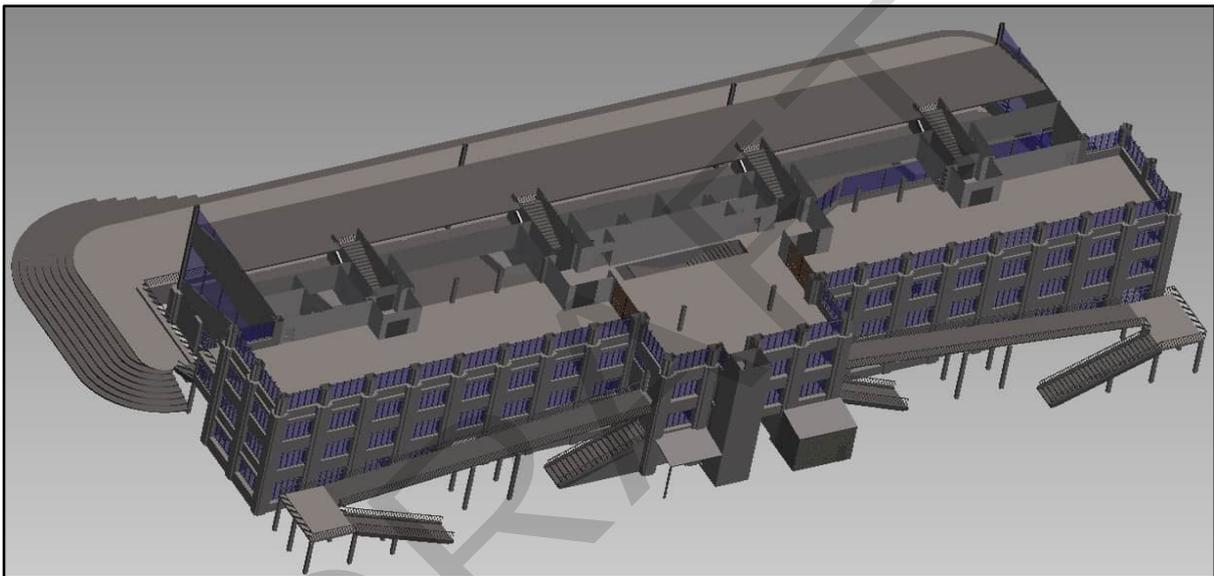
Cutaway showing walls and columns at the third floor level at GNS
